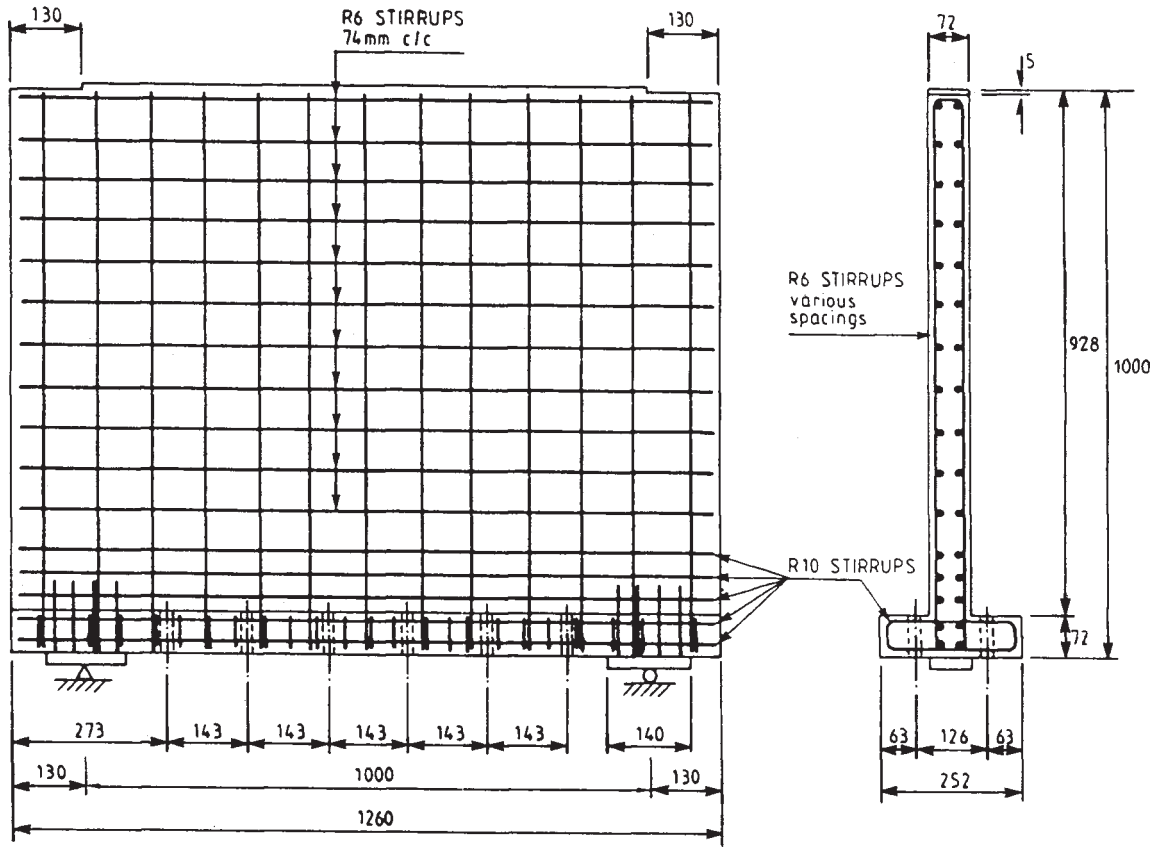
Dimensions and reinforcement details of Leeds test wall-beams (dimensions in mm).
